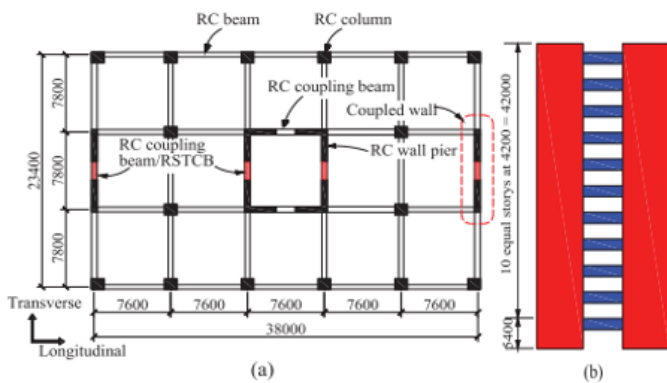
11-storey of prototype structure geometry (units: mm): (a) typical floor plan and (b) elevation of coupled wall [5]
